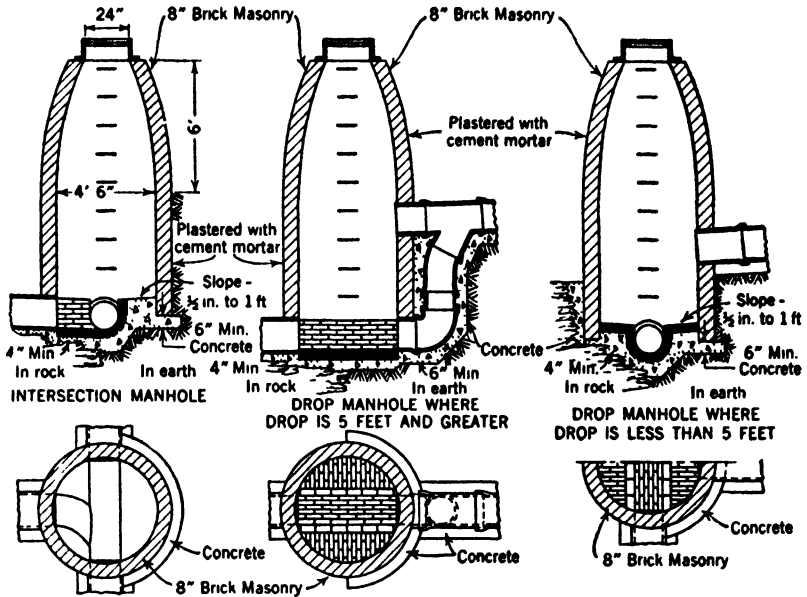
Typical Manholes for Tile Pipe Sewers.
